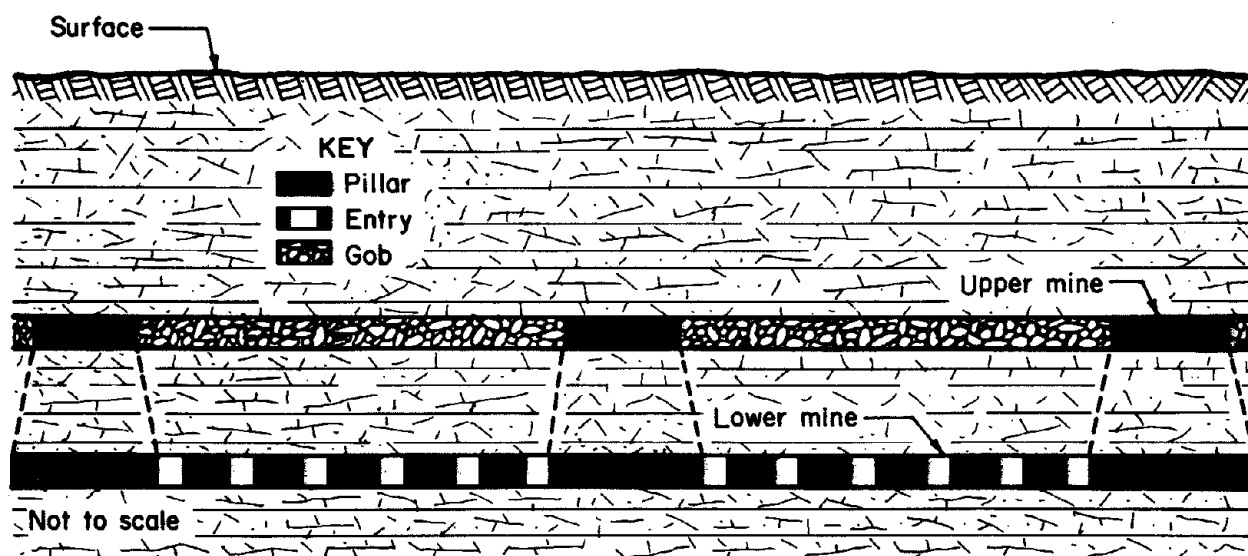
Superpositioned panels with upper seam mined first and wider barrier pillars in lower mine to protect outer entries from pillar load transfer.
